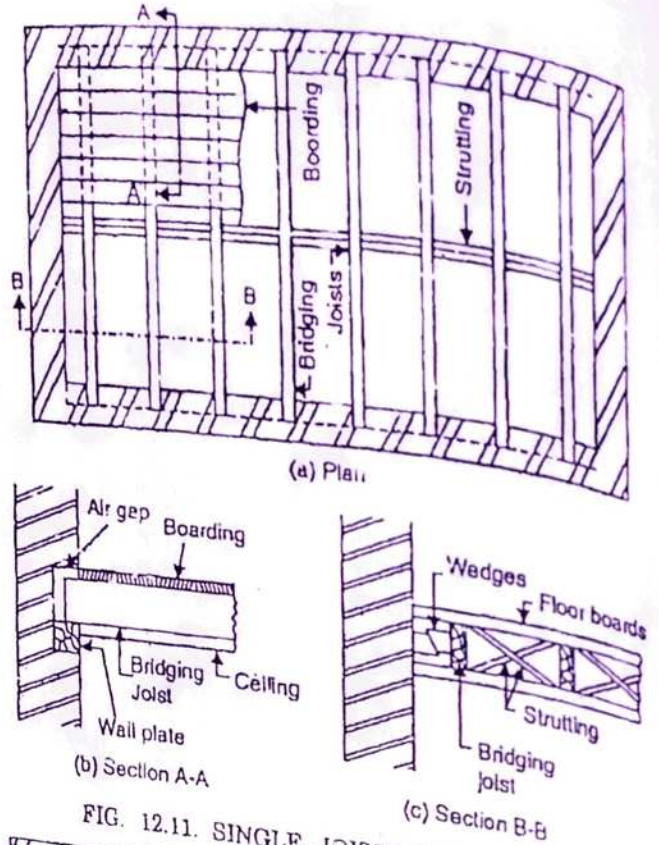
SINGLE JOISTS TIMBER FLOORING.
